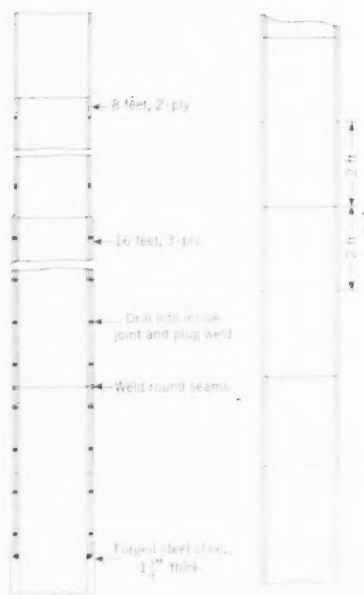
Double-wall well casing, with starter section at left and casing as installed at right.
